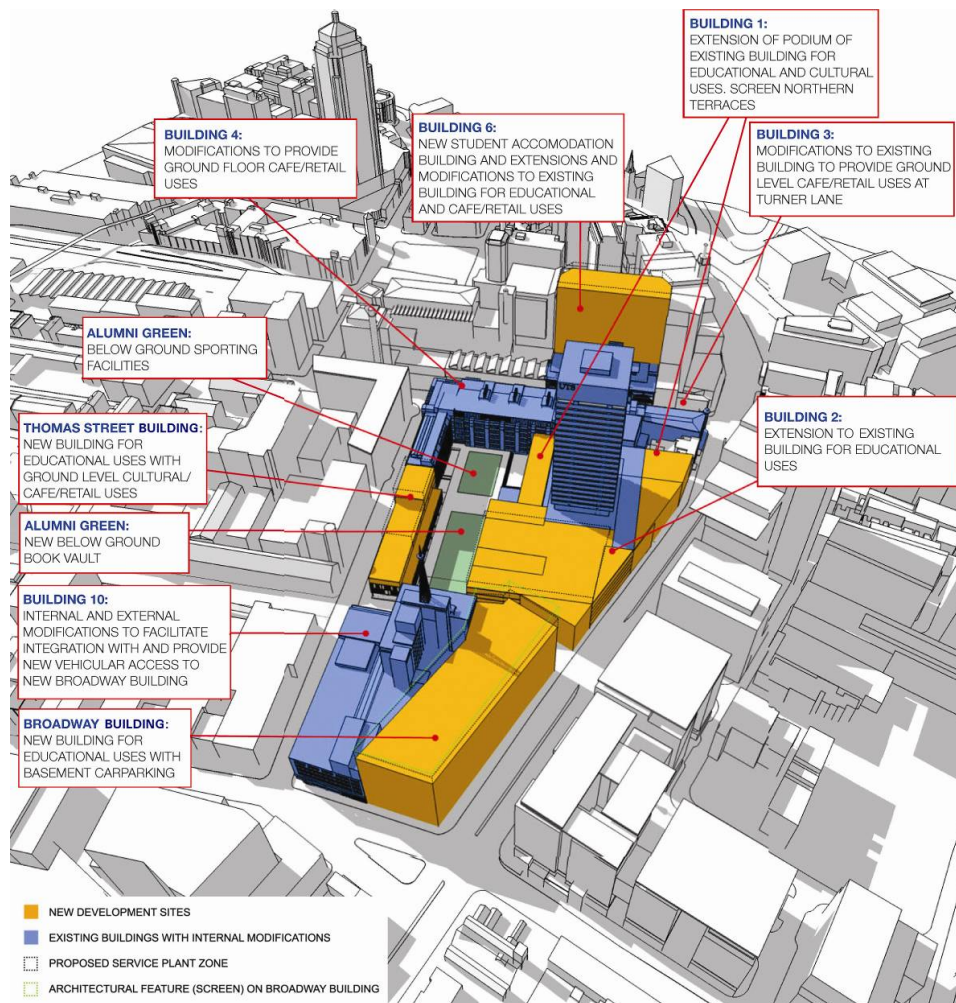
3D Model of approved concept plan (Source: BVN, DCM and JBA)
